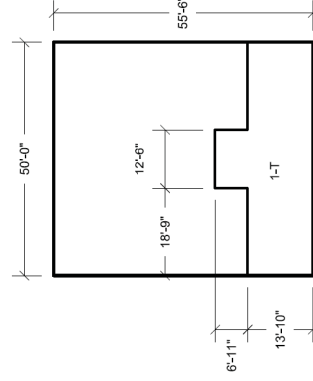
H-6-122A: COOLING TOWER INTERNAL WALL LOOKING WEST
